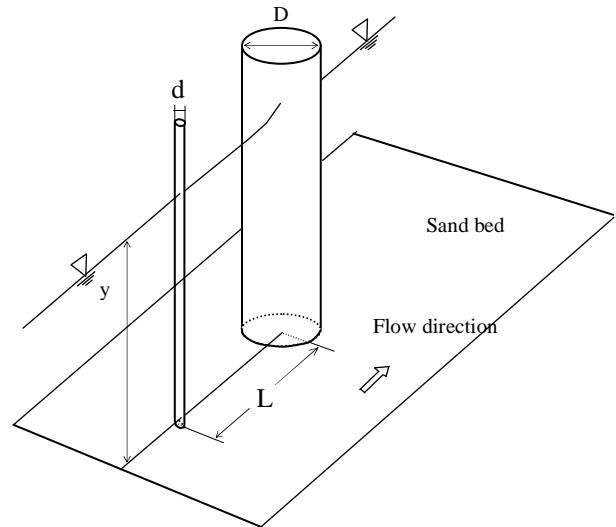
Definition sketch of a sacrificial pile-pier arrangement
